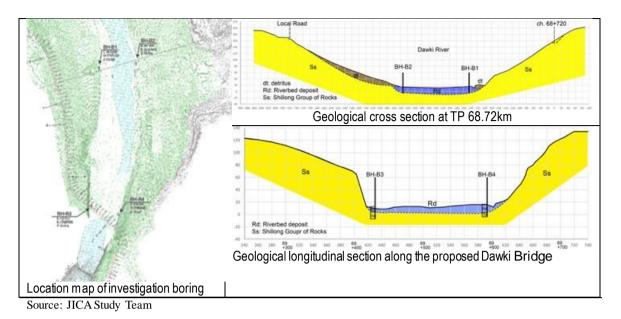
Geological Cross Section at TP68.72km and proposed Dawki Bridge
